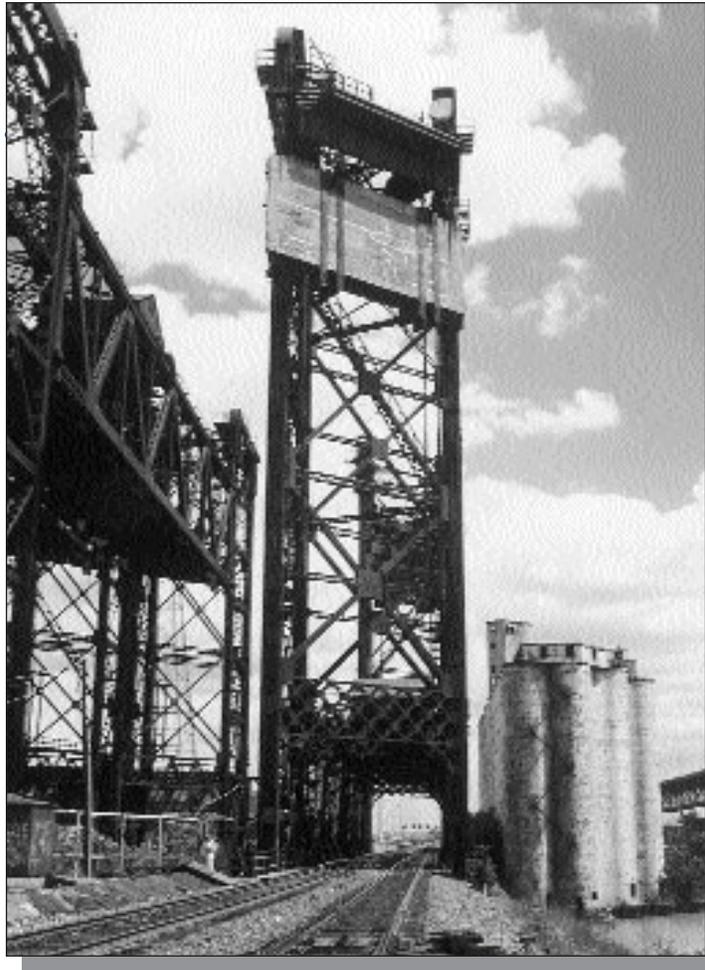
Figure B – Two adjacent lift bridges, one with span raised and one with span lowered. Note the large concrete counterweight.
